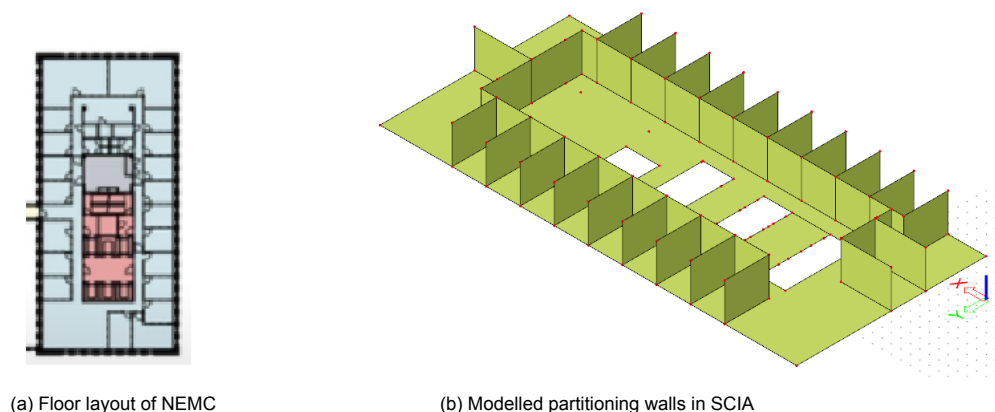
Floor plan and added partitioning walls to the SCIA model
